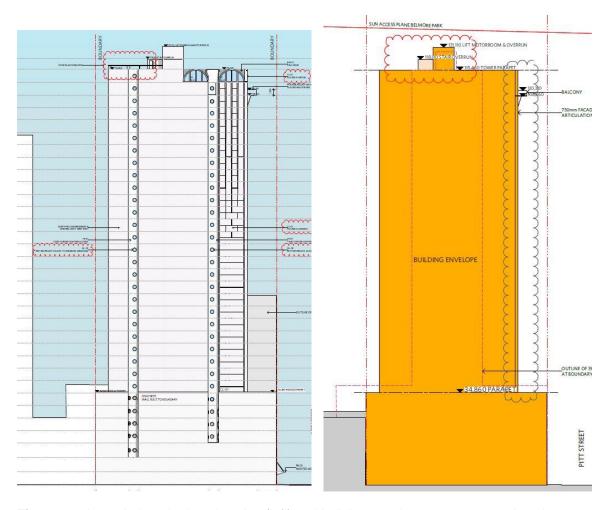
Amended north elevation plan (left) and building envelope east west section plan D/2015/661/B (right)
